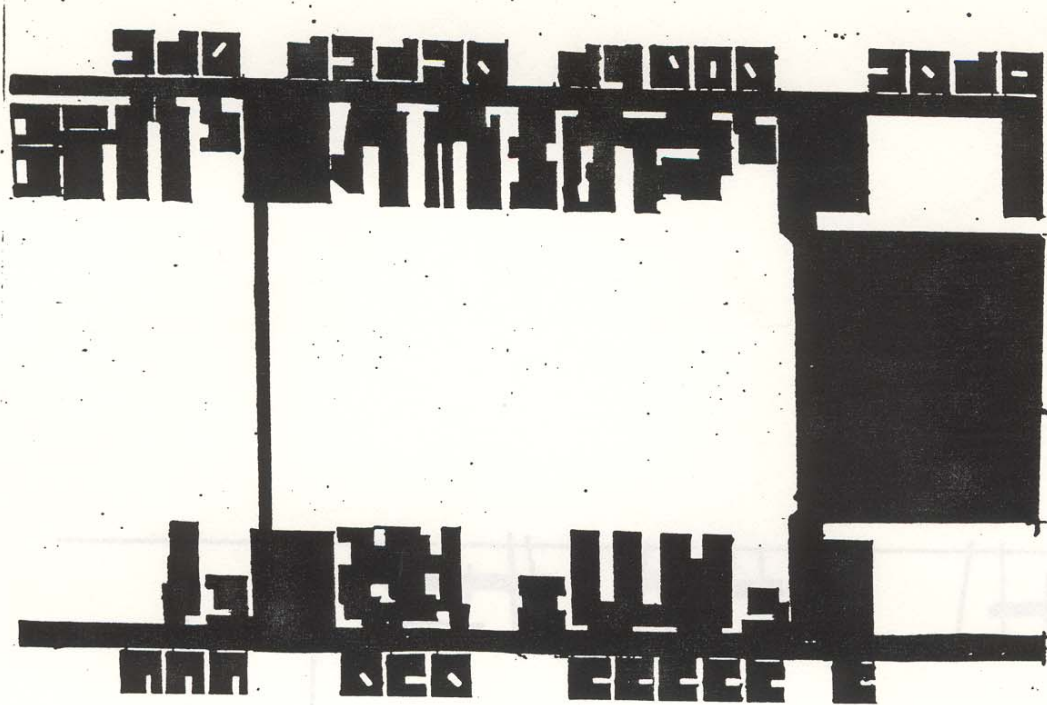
free floor area (Shown in black) of the ground floor at Schlumberger
